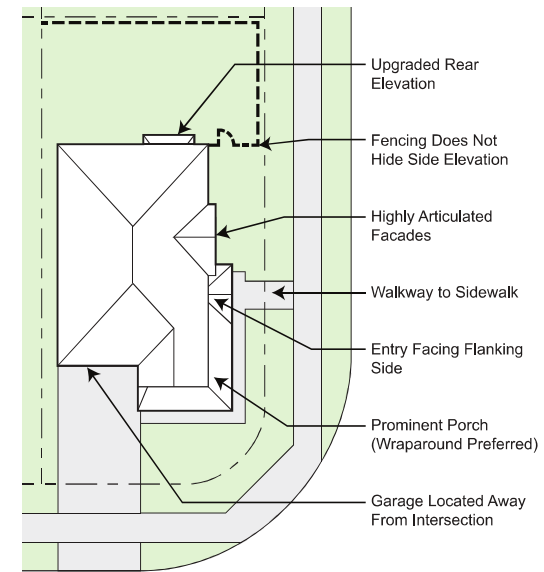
Conceptual plan view of Corner Lot Dwelling
